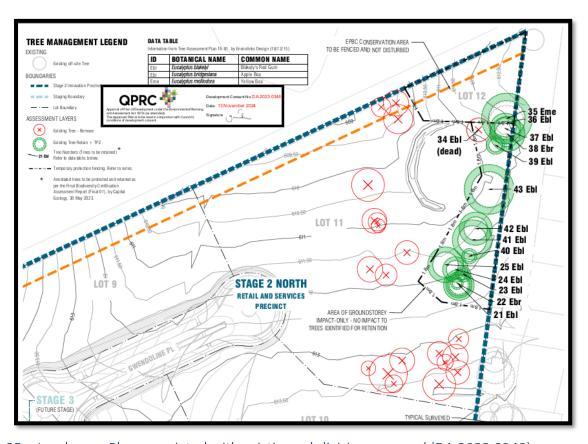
Landscape Plan associated with existing subdivision approval (DA.2023.0348).
